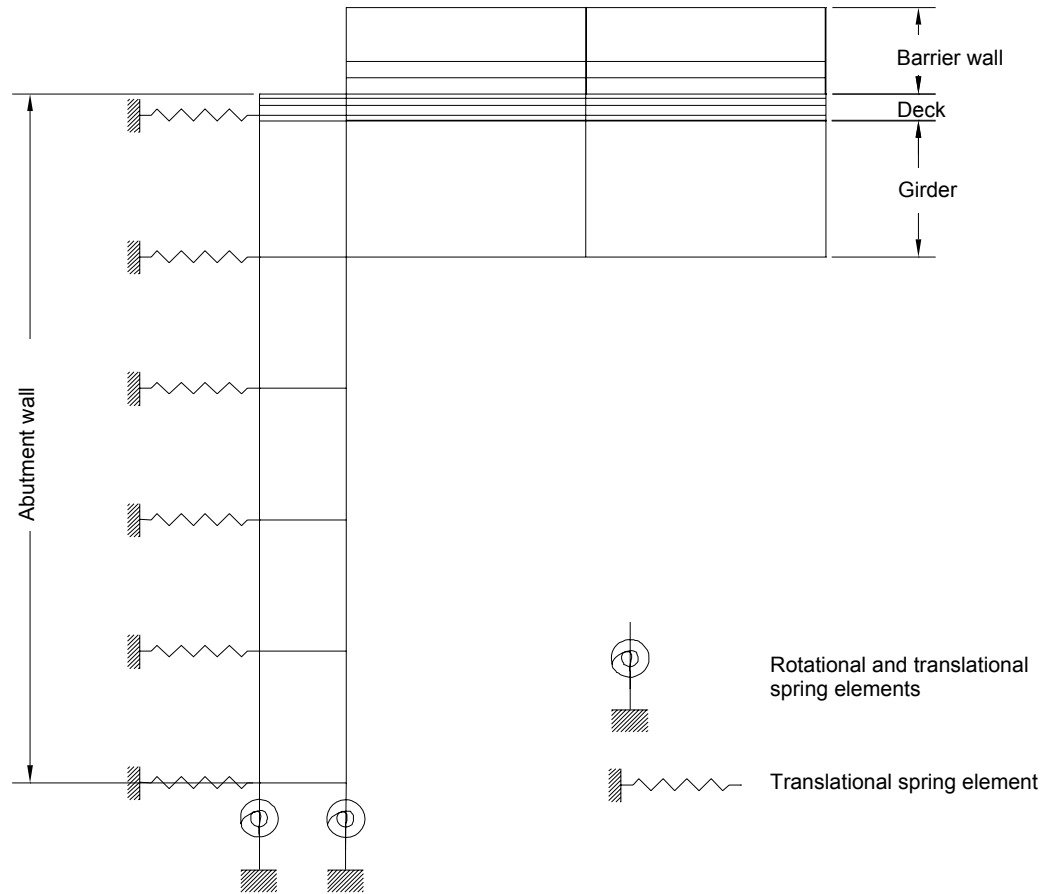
Partial side view of bridge abutment wall showing foundation spring elements in the FE model.
